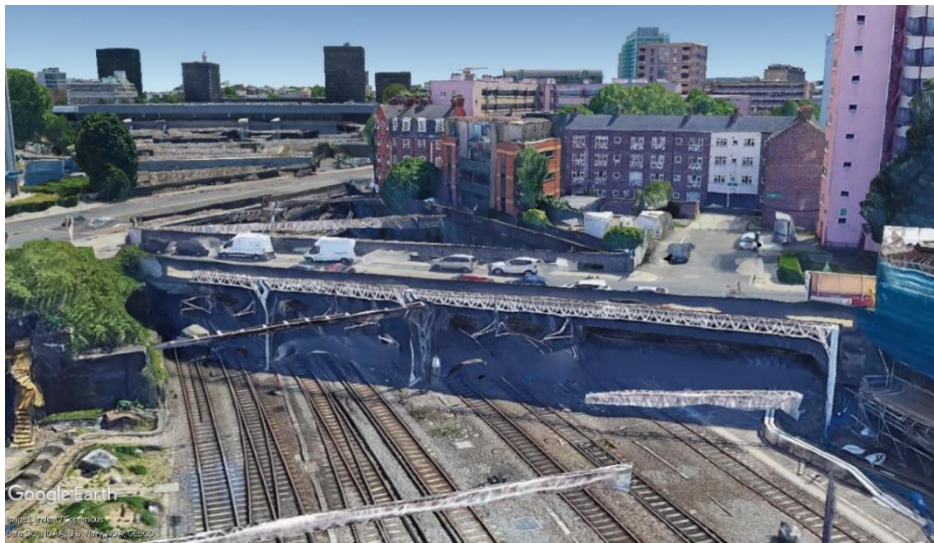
Pre-construction views of Granby Terrace Bridge (Source: Google Earth)
